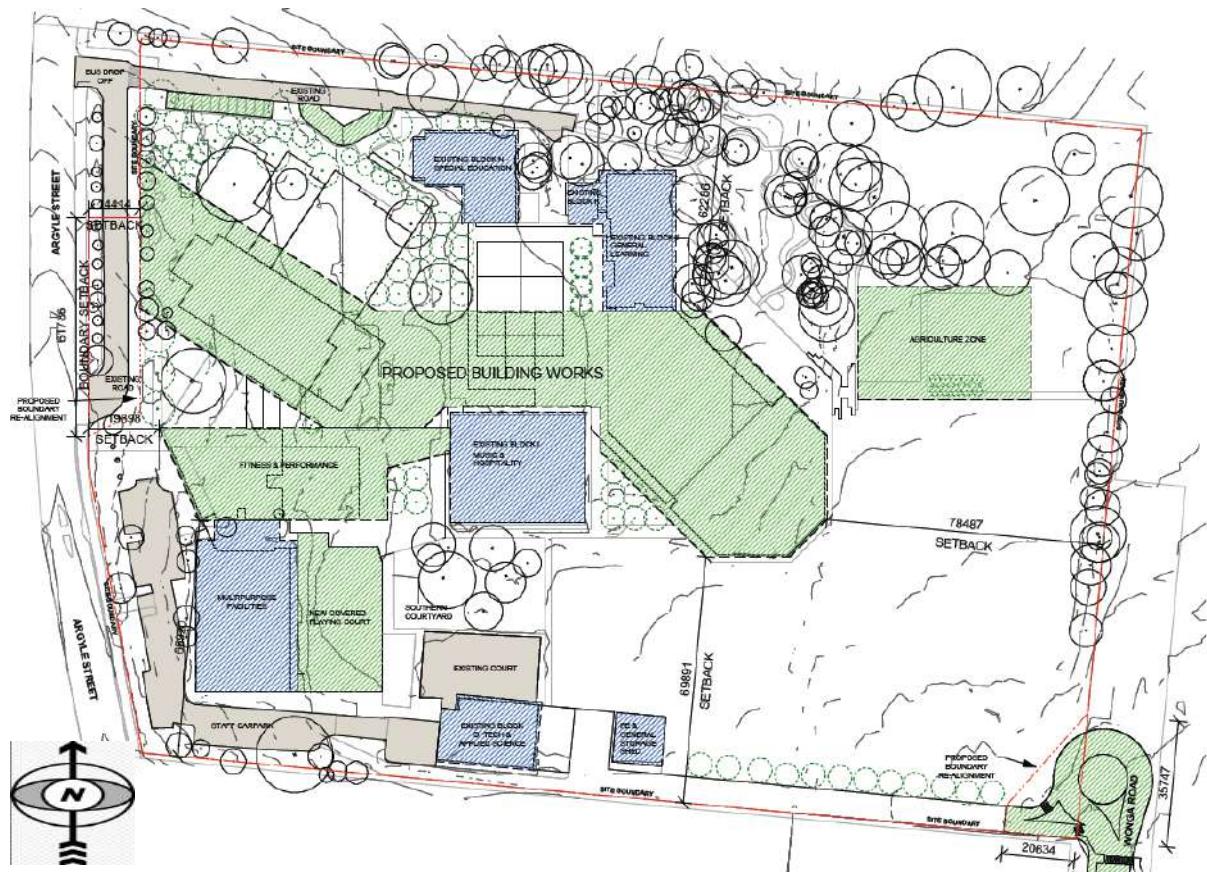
The Architectural Site Plan (by Billard Leece Architects)
